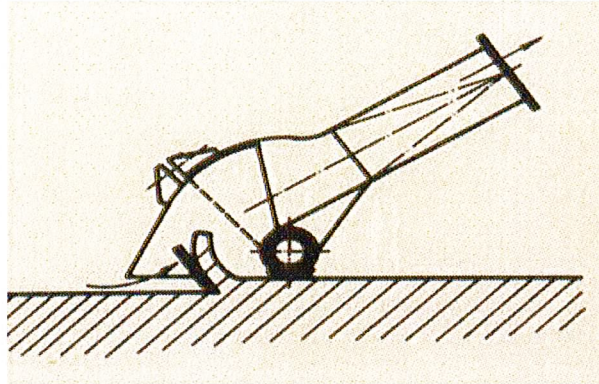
The IHC drag-head, although intended for silts, could be fitted with a cutting tool nickname to be a “cheese cutter”, to harvest clayey silt layers
